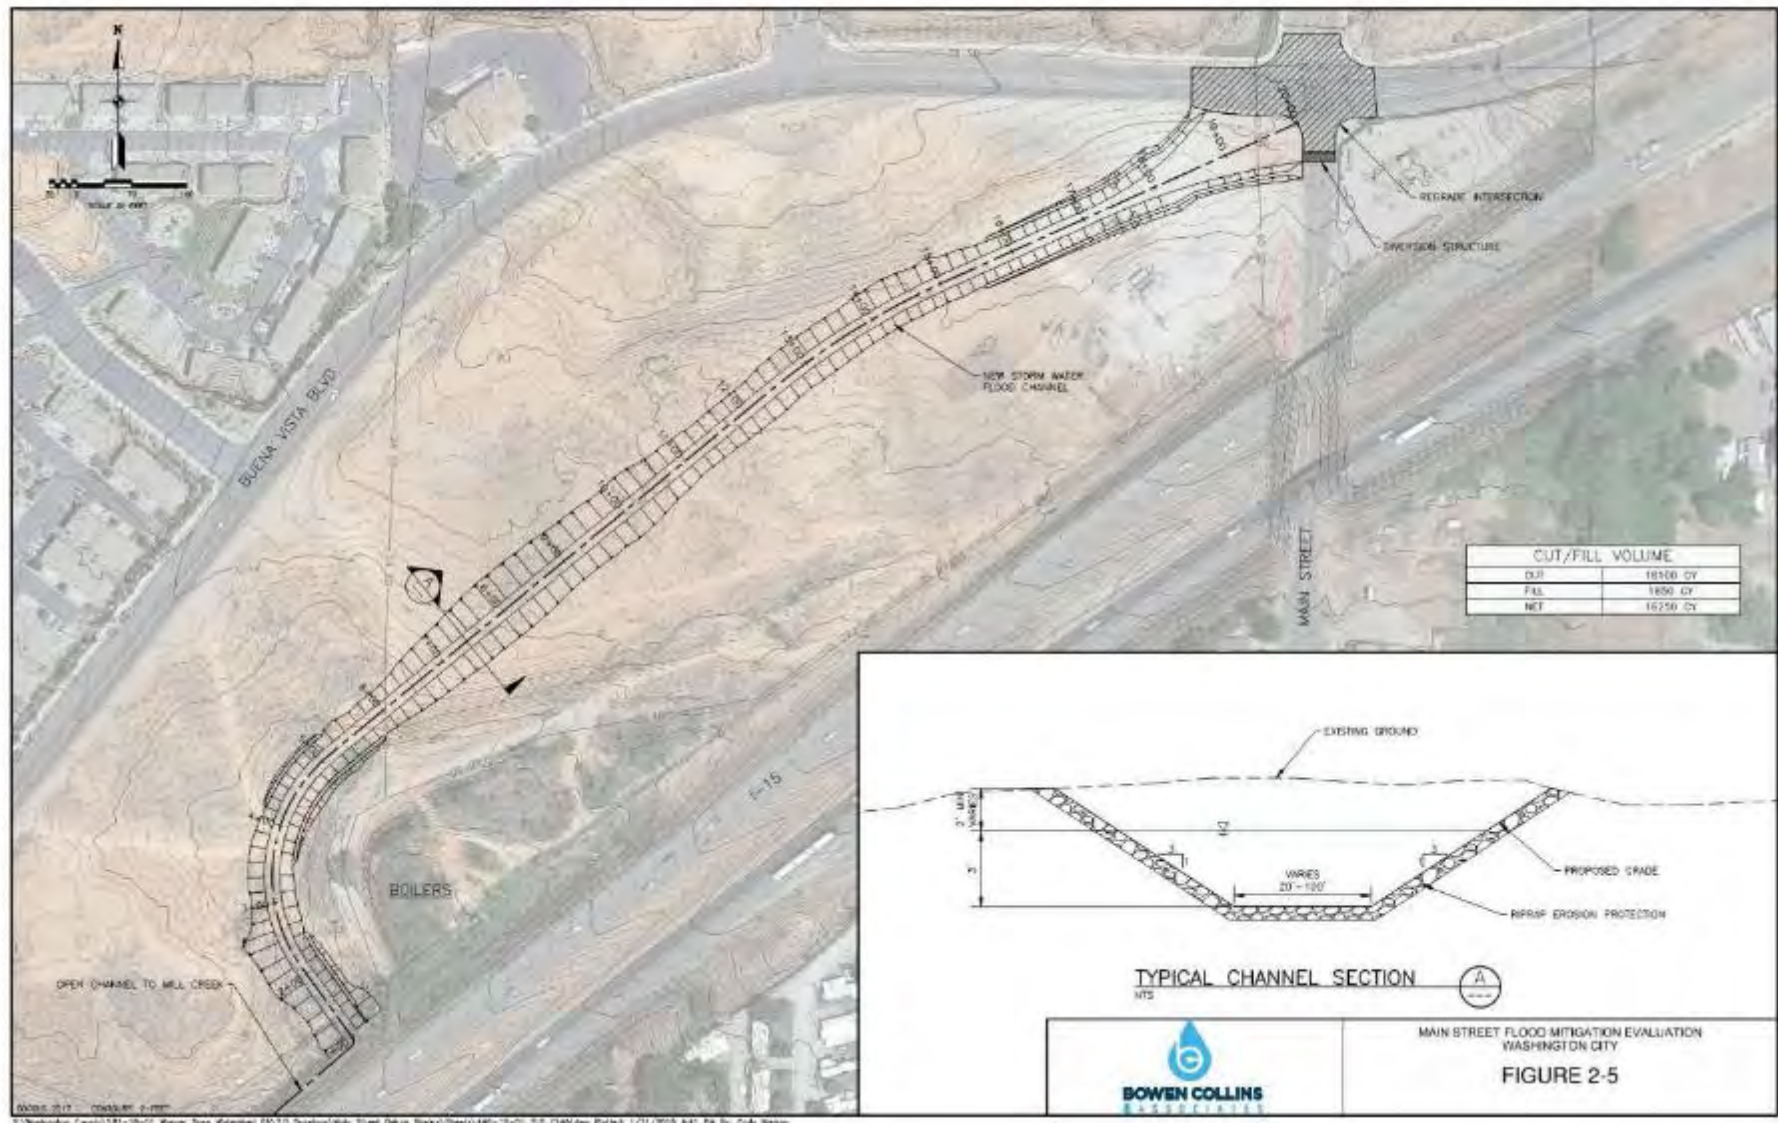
Mill Creek Flood Channel (Alternative 2)
